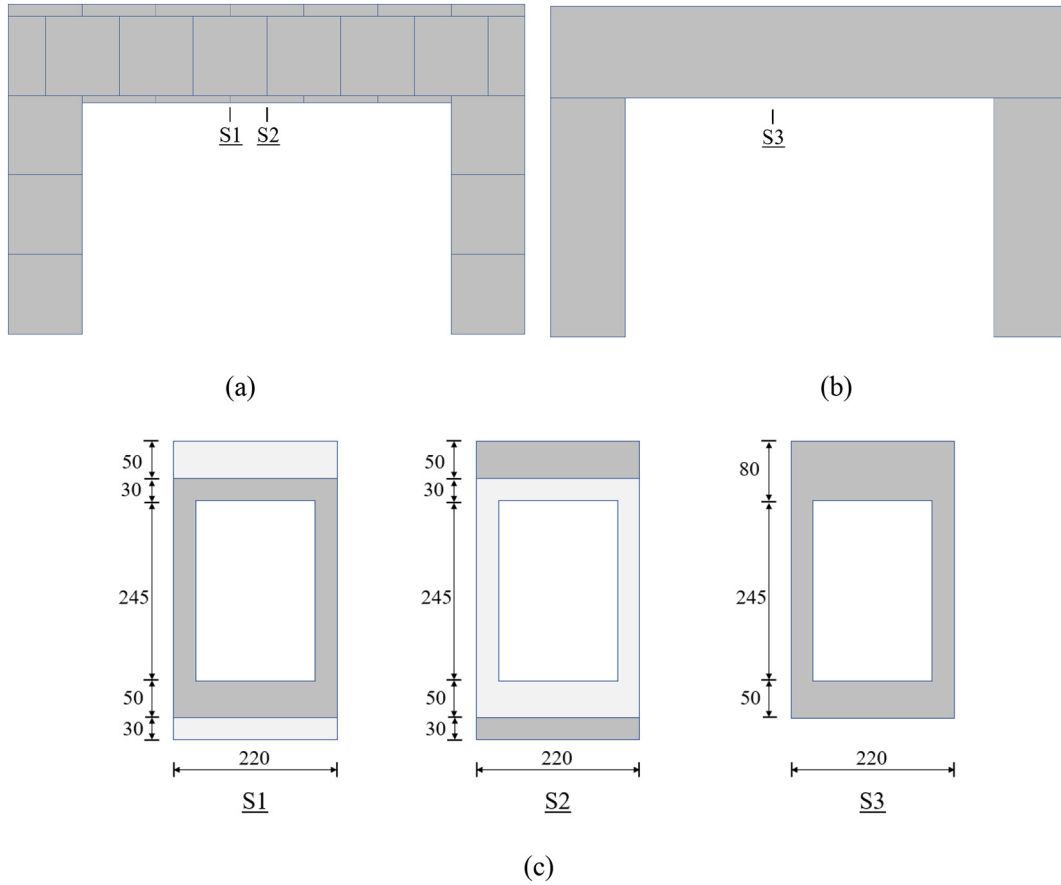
Depiction of sections: (a) elevation view of reconfigured frame; (b) elevation view of precast beam and columns; (c) critical cross sections. Sections S1 and S2 are depicted in (a), and section S3 is depicted in (b). In S1 and S2 in (c), the area in the light color is discontinuous and thus not subjected to tension, as depicted in (a).
